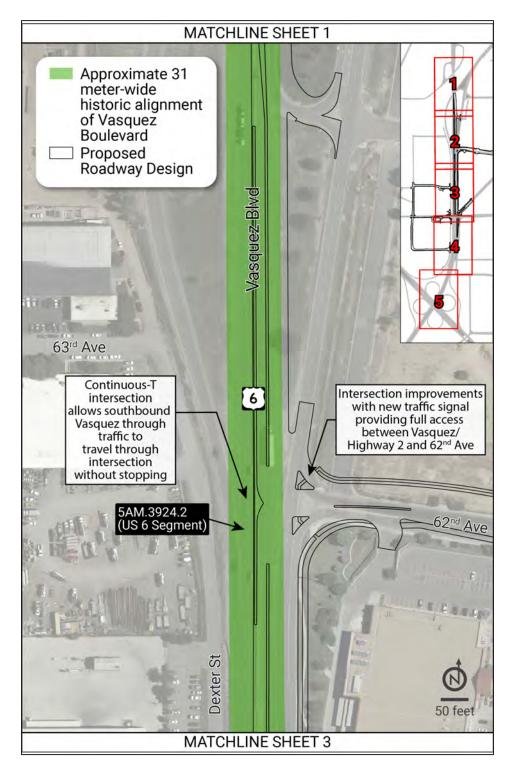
Vasquez Boulevard Proposed and Existing, Sheet 3
